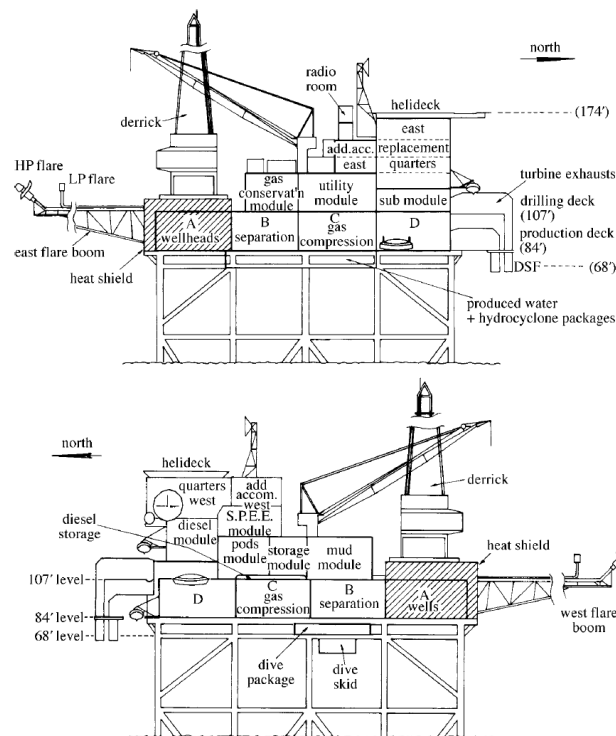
Elevation layout of the Piper Alpha Platform, from Drysdale and Sylvester-Evans [38]
